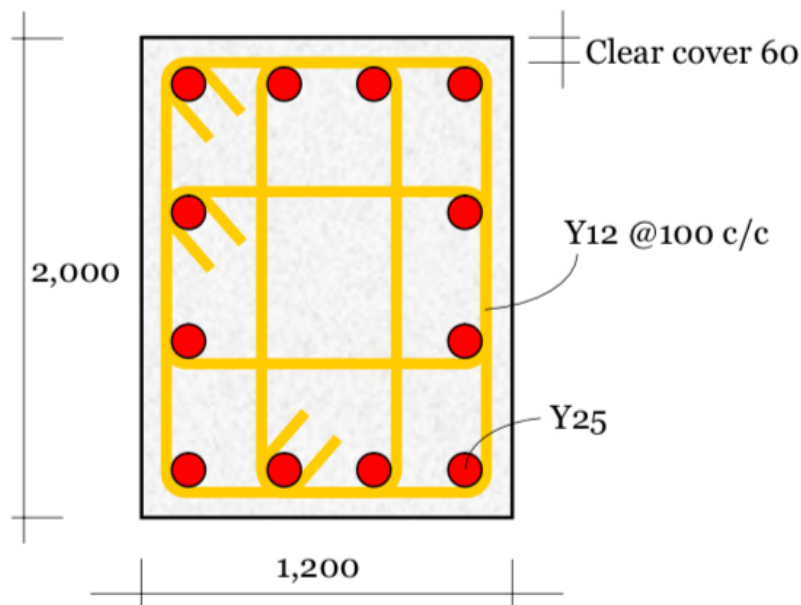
Cross-section geometry of RC pier (all dimensions are in mm)
